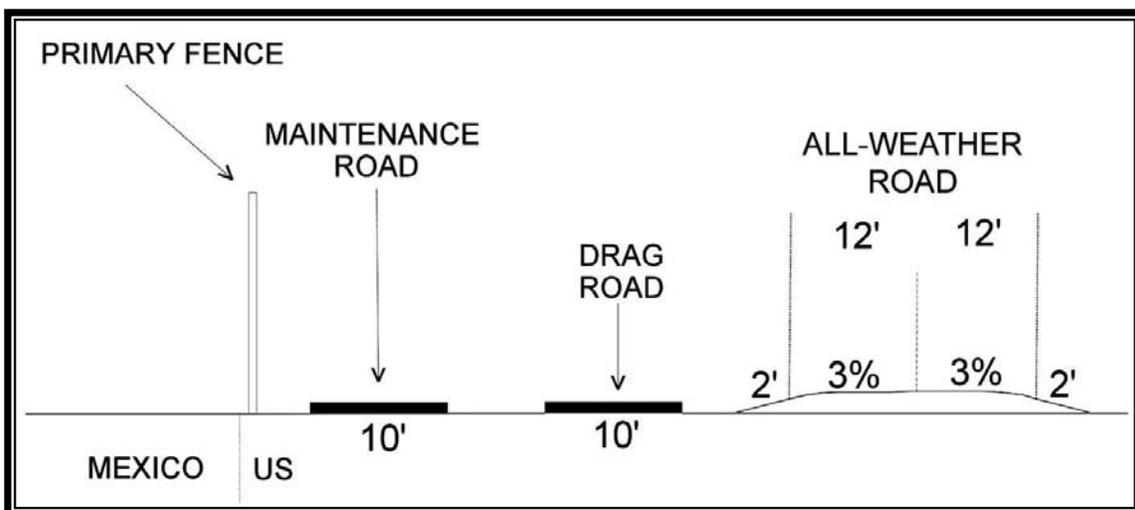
Typical All-Weather Road and Drag Road Layout
